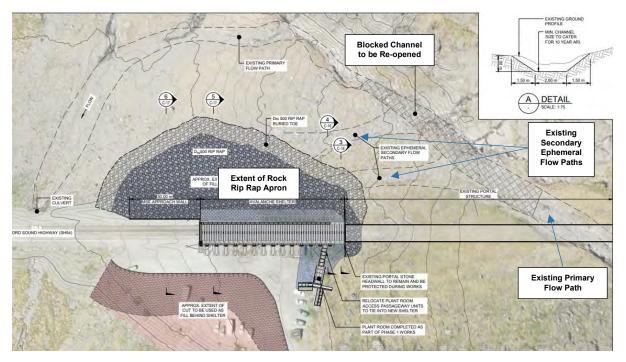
General arrangement plan showing rock rip rap apron and proposal to cut-off flow to secondary channels by clearing debris from primary channel, WSP 2022
